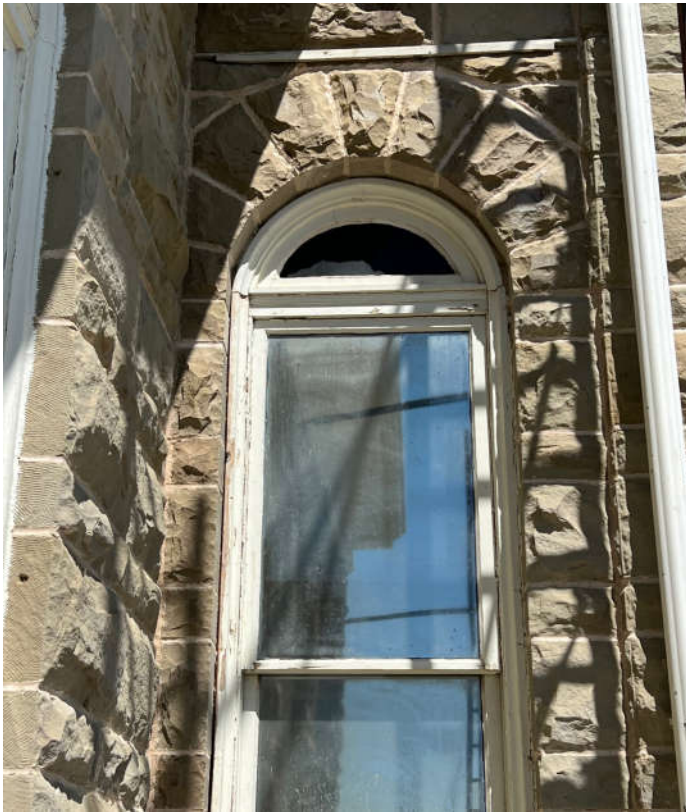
Replacement stone was laid at the arched head and west jamb of this second floor south facing window.
